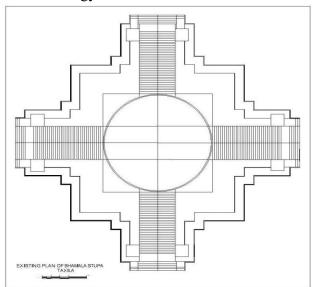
Bhamala Excavations 2014-15: Plan of the main stupa
